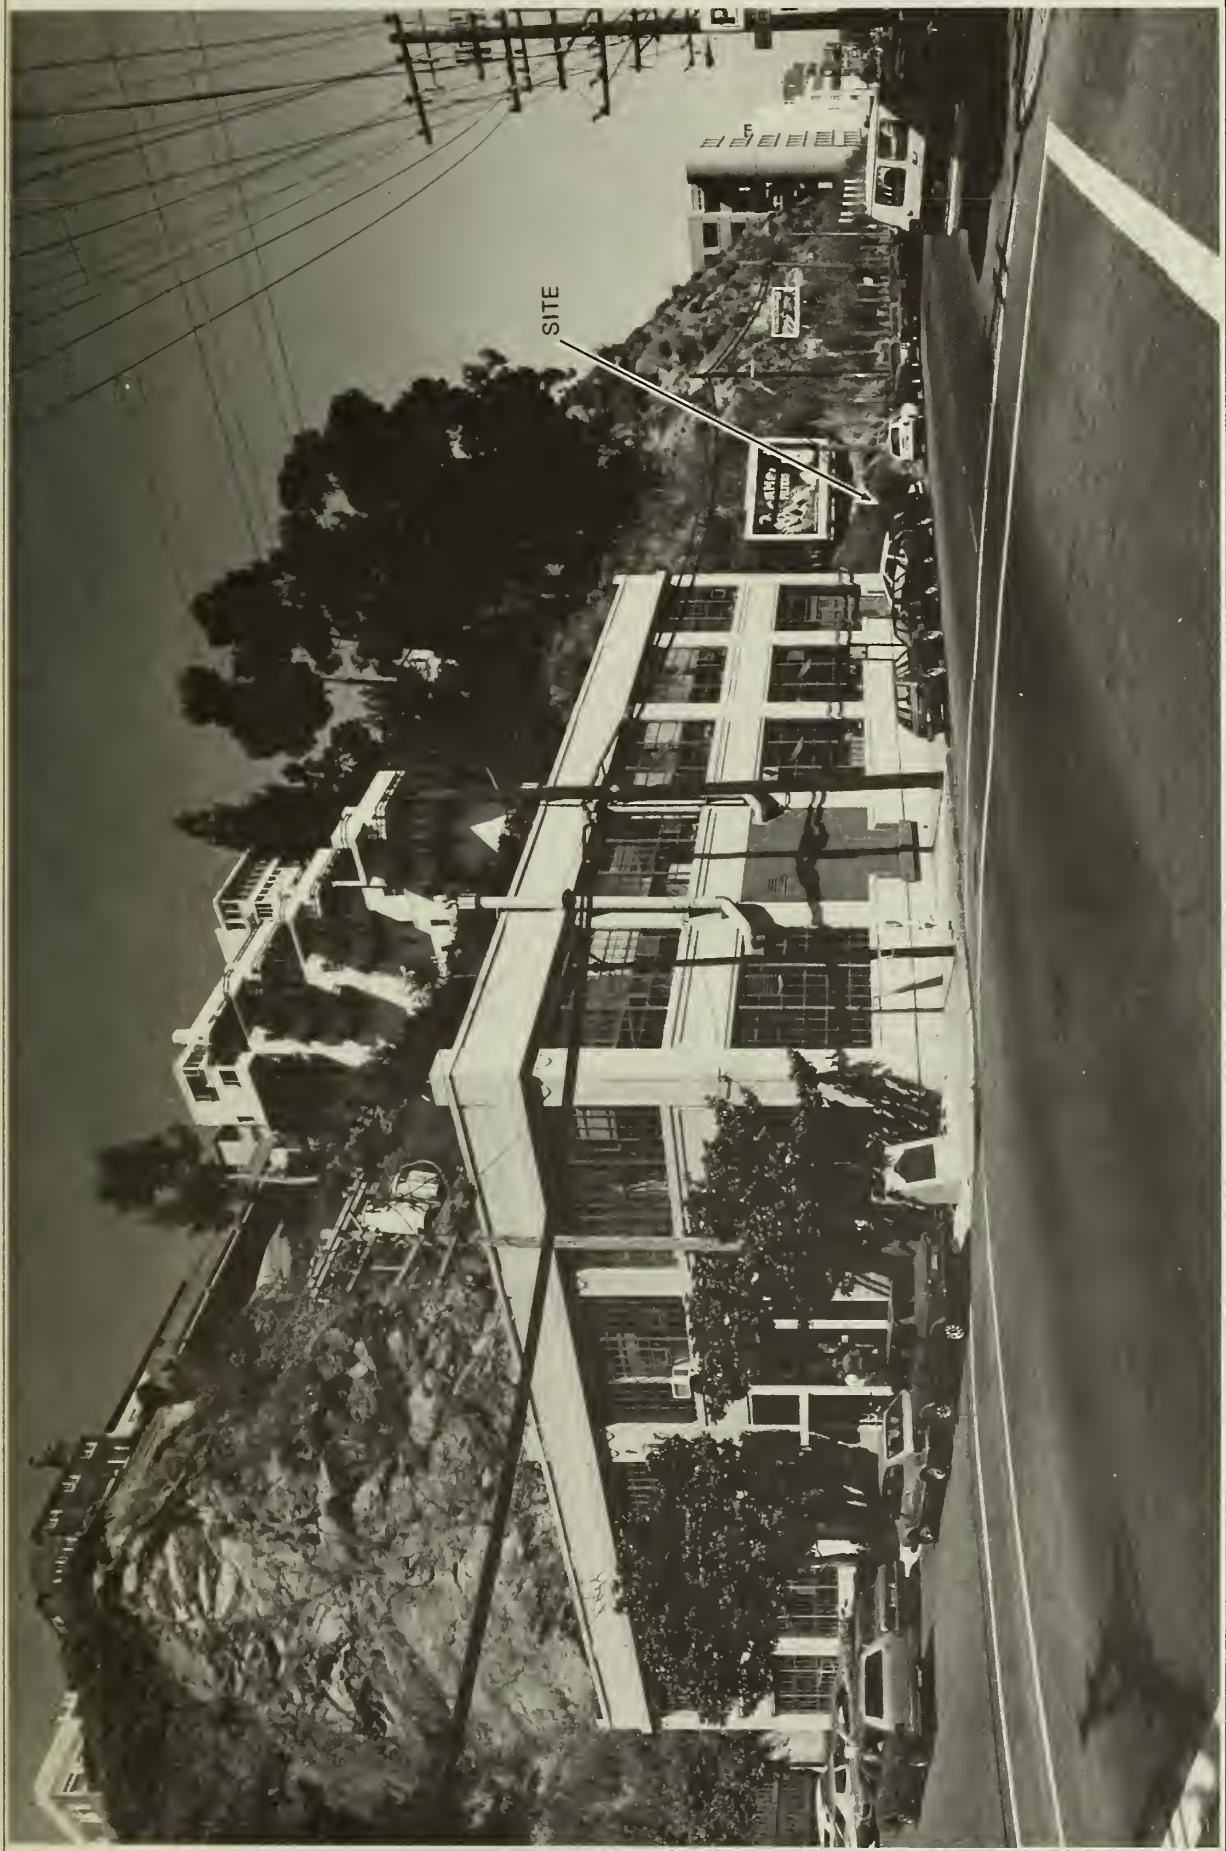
VIEW OF THE SITE FROM SANSOME STREET LOOKING NORTHWEST
